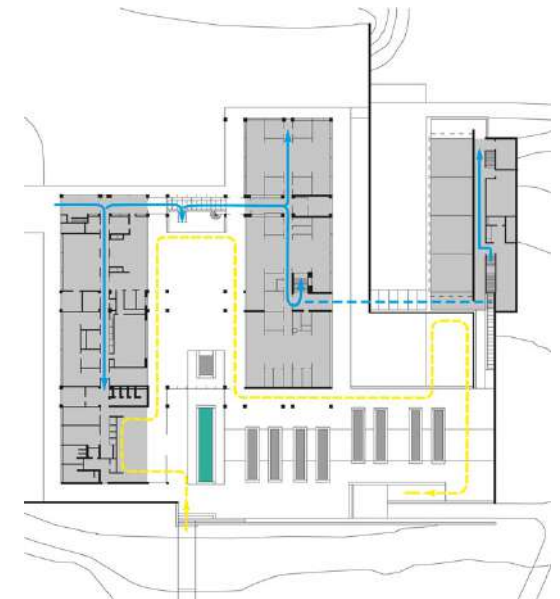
Plan layout circulation (Stanton Williams Architects: online).
